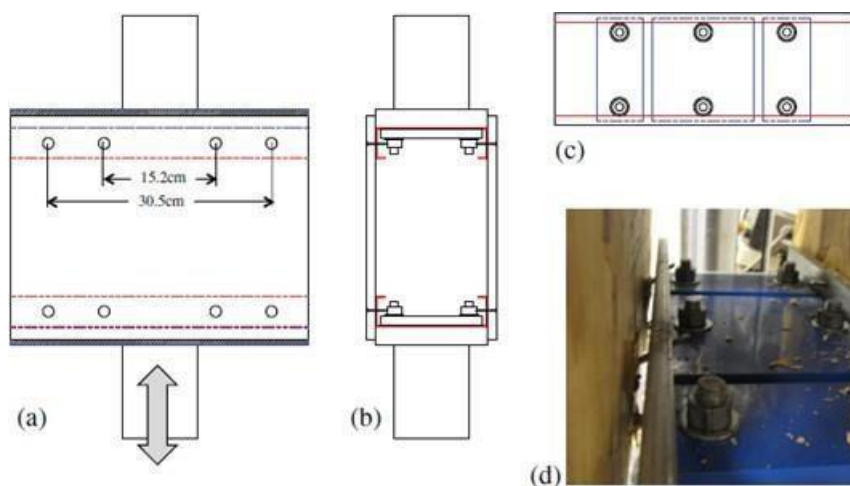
(a) Front view of loaded specimen, dashed lines indicate hidden stud, arrow indicates direction and location of loading [13]
